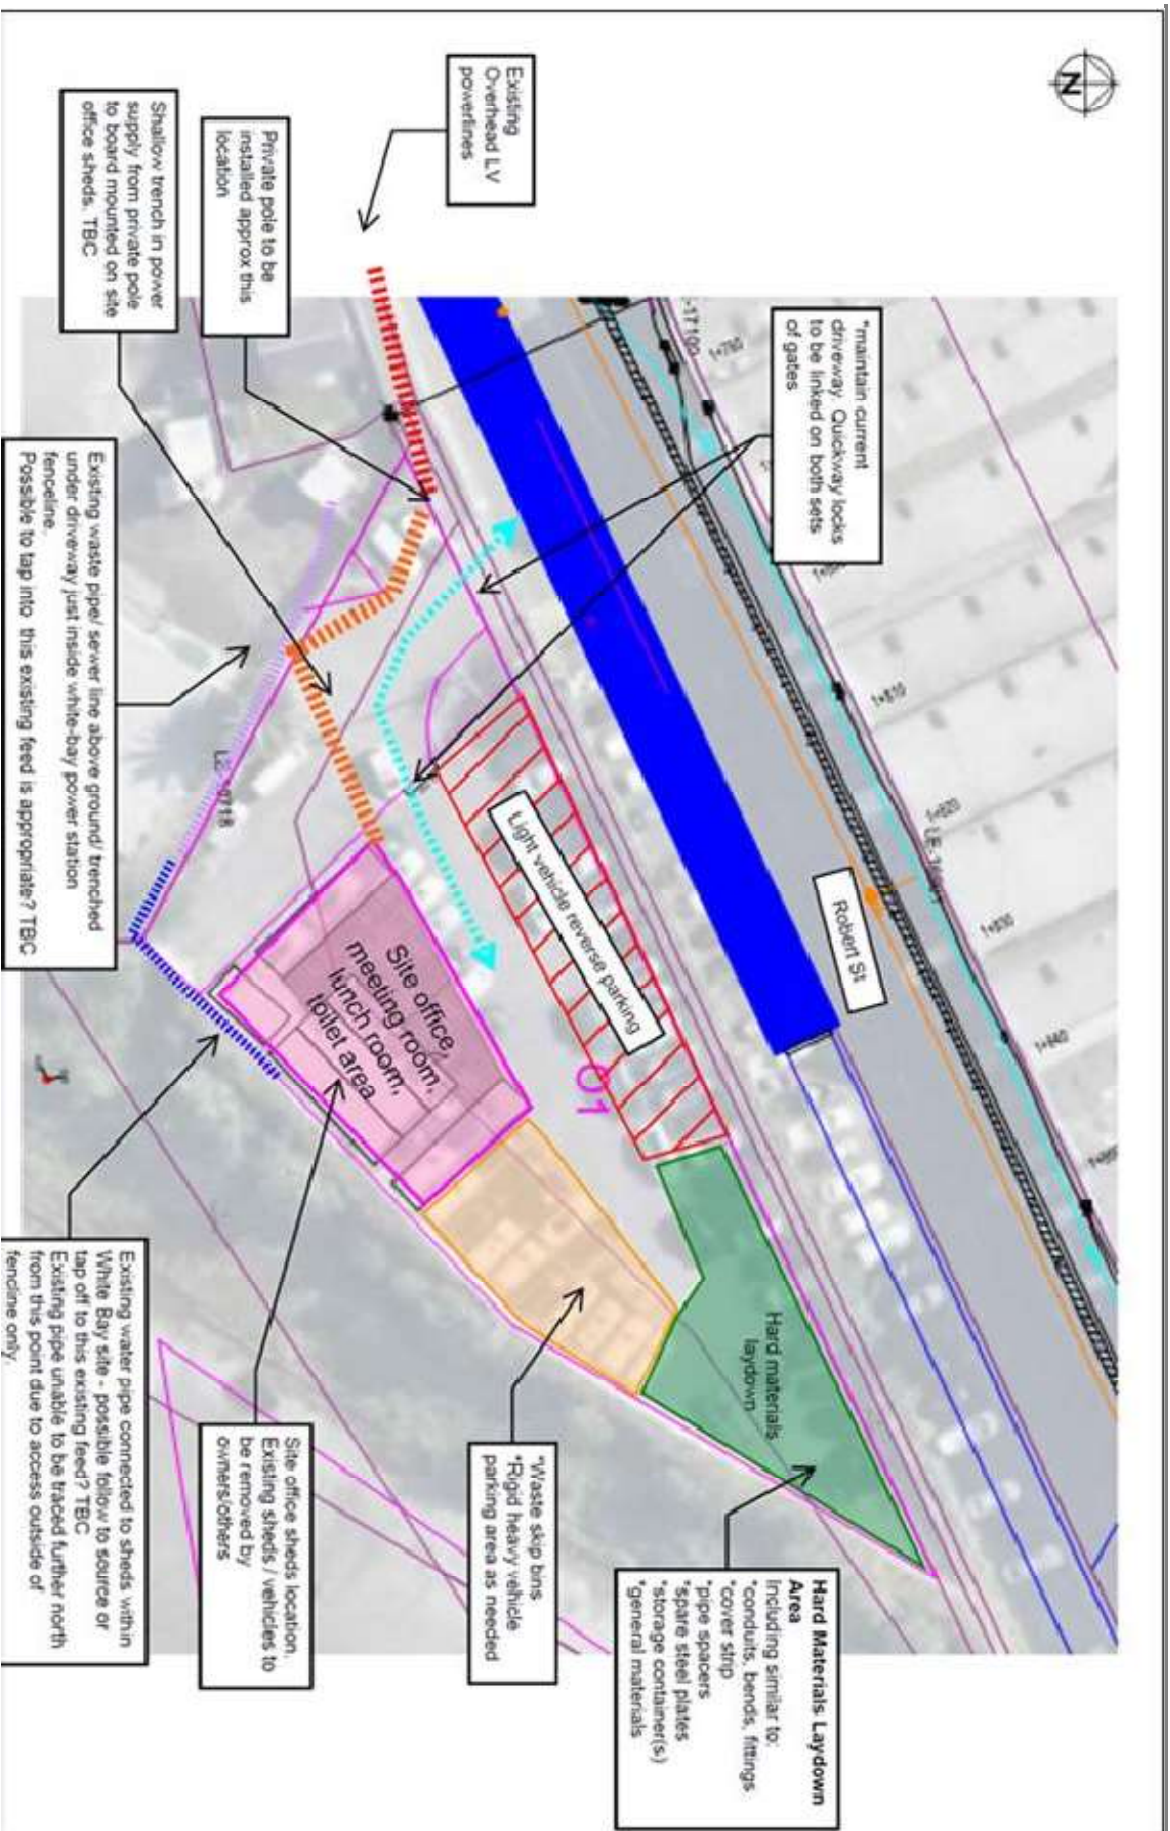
Indicative site layout for Minor Ancillary Facility Area O1
